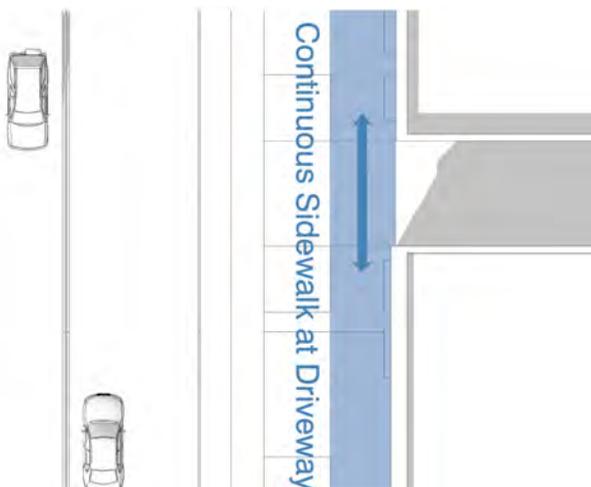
X-2.3.6(2) Sidewalk Configuration: Sidewalks shall be continuous and uninterrupted at driveways.
